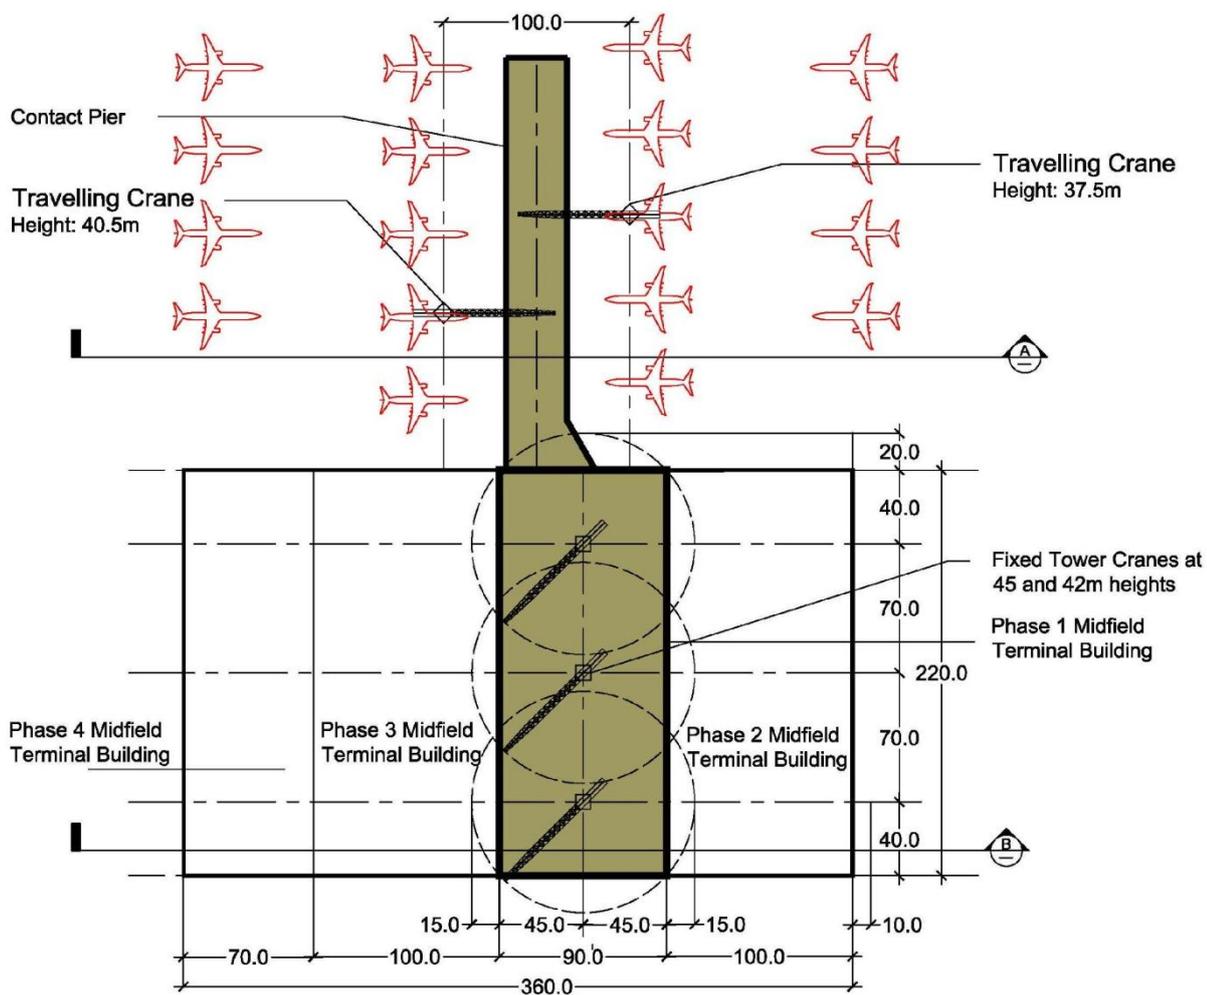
Potential Crane Configuration to Support Phase 1 Construction of Midfield Terminal Building and Contact Pier.
